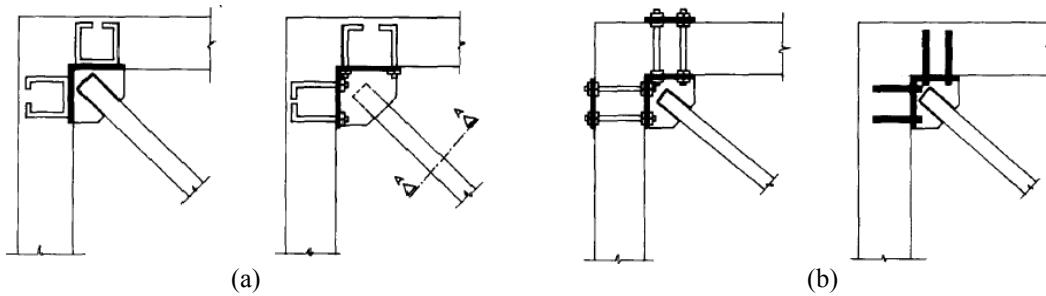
(a) Connection detail for under construction frame (b) Connection detail for under construction frame
